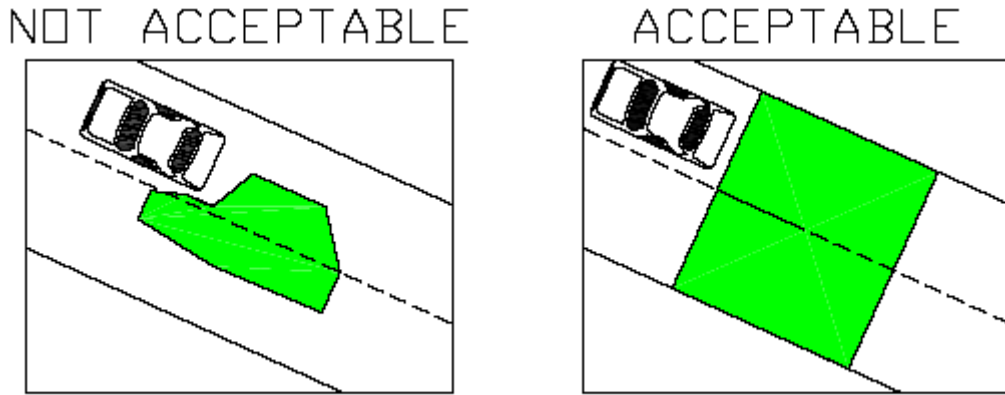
Example 1: Do not construct patches with angled sides and irregular shapes.
